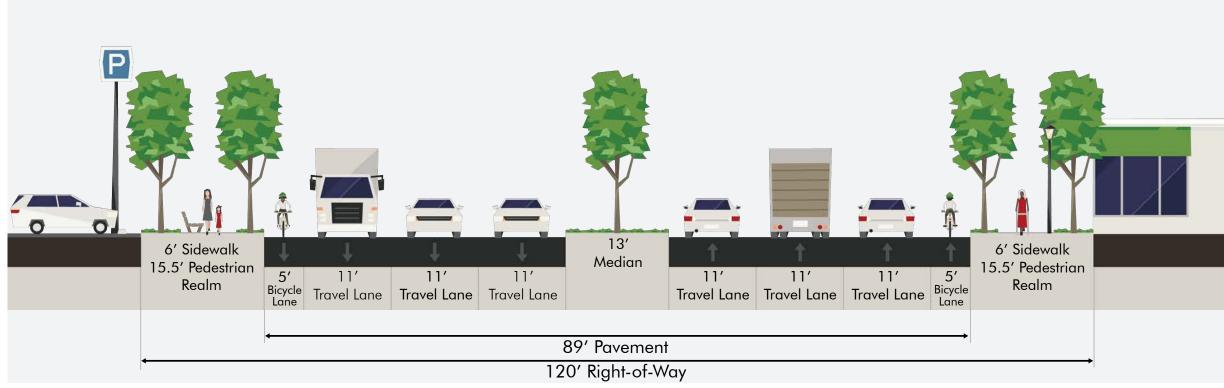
Proposed Typical Cross-section - Roark Road to Dove Country Drive
